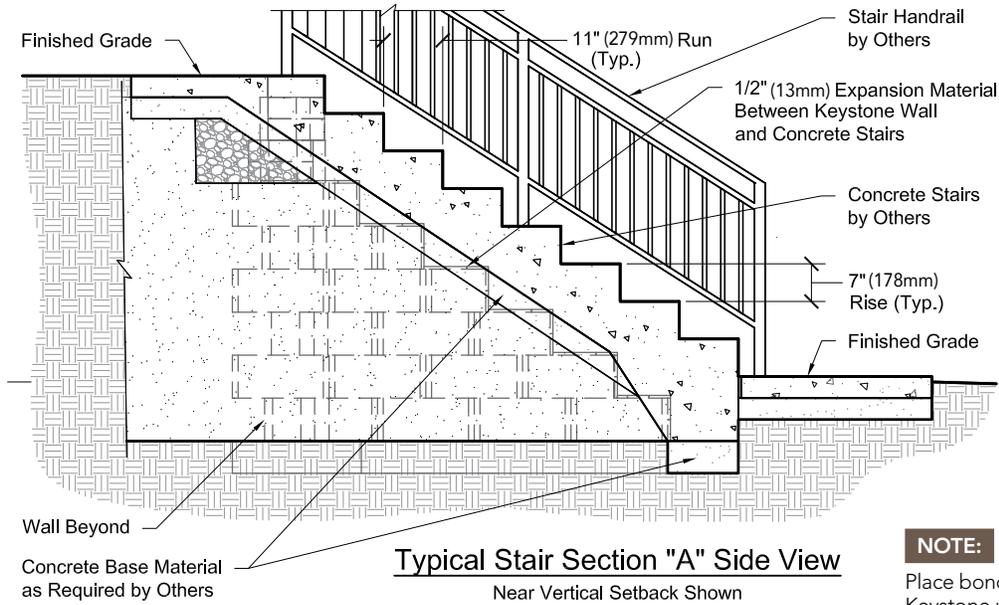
STAIR IN WALL DETAIL ELEVATION
